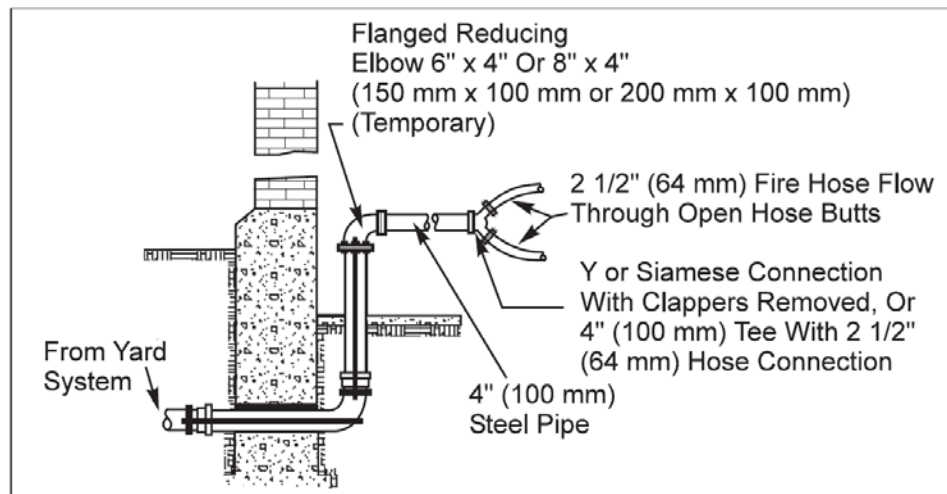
Arrangement for flushing of sprinkler riser underground lead-in piping.
